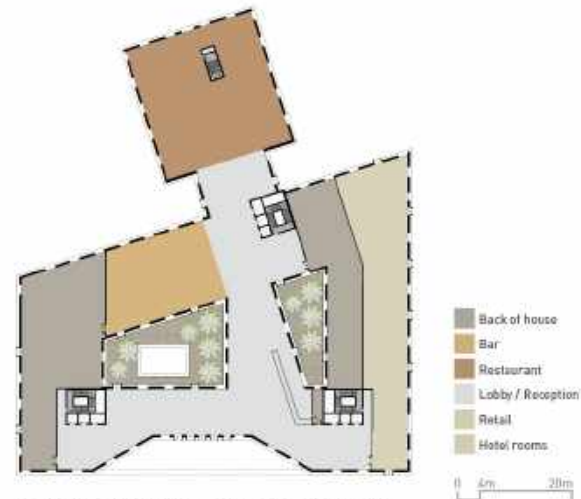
Ground floor of the 4-5* Hotel in Irfan Central Boulevard
